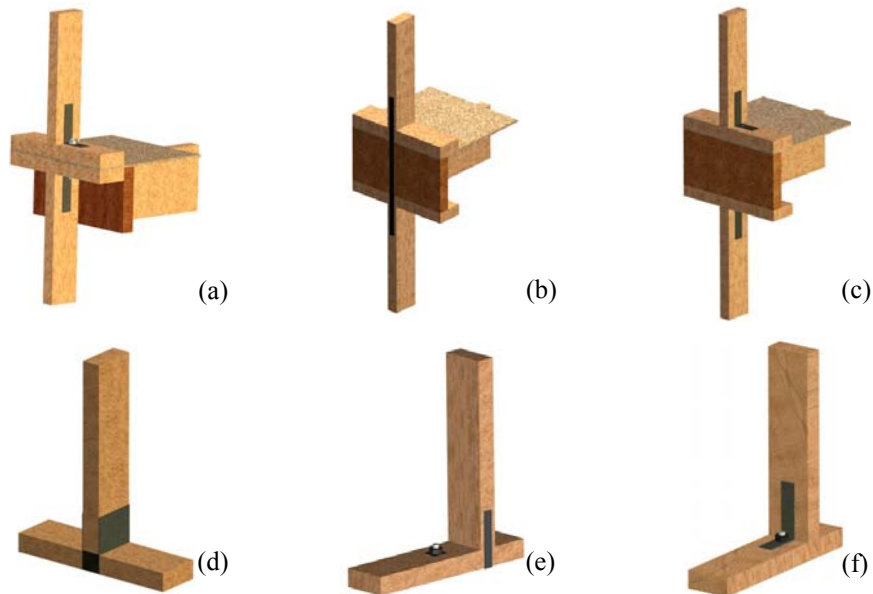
Examples of inter-component connections (a-c) and of anchorage connections (d-f).
